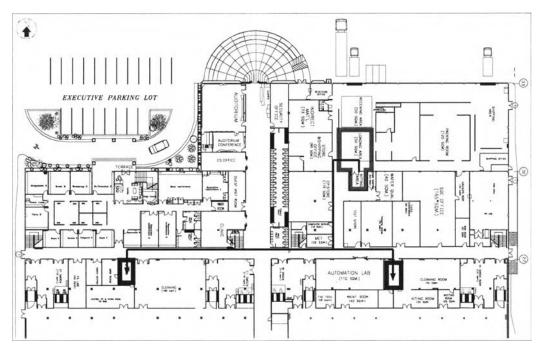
Preparation Area Outside Cleanroom to Cleanroom Load in
